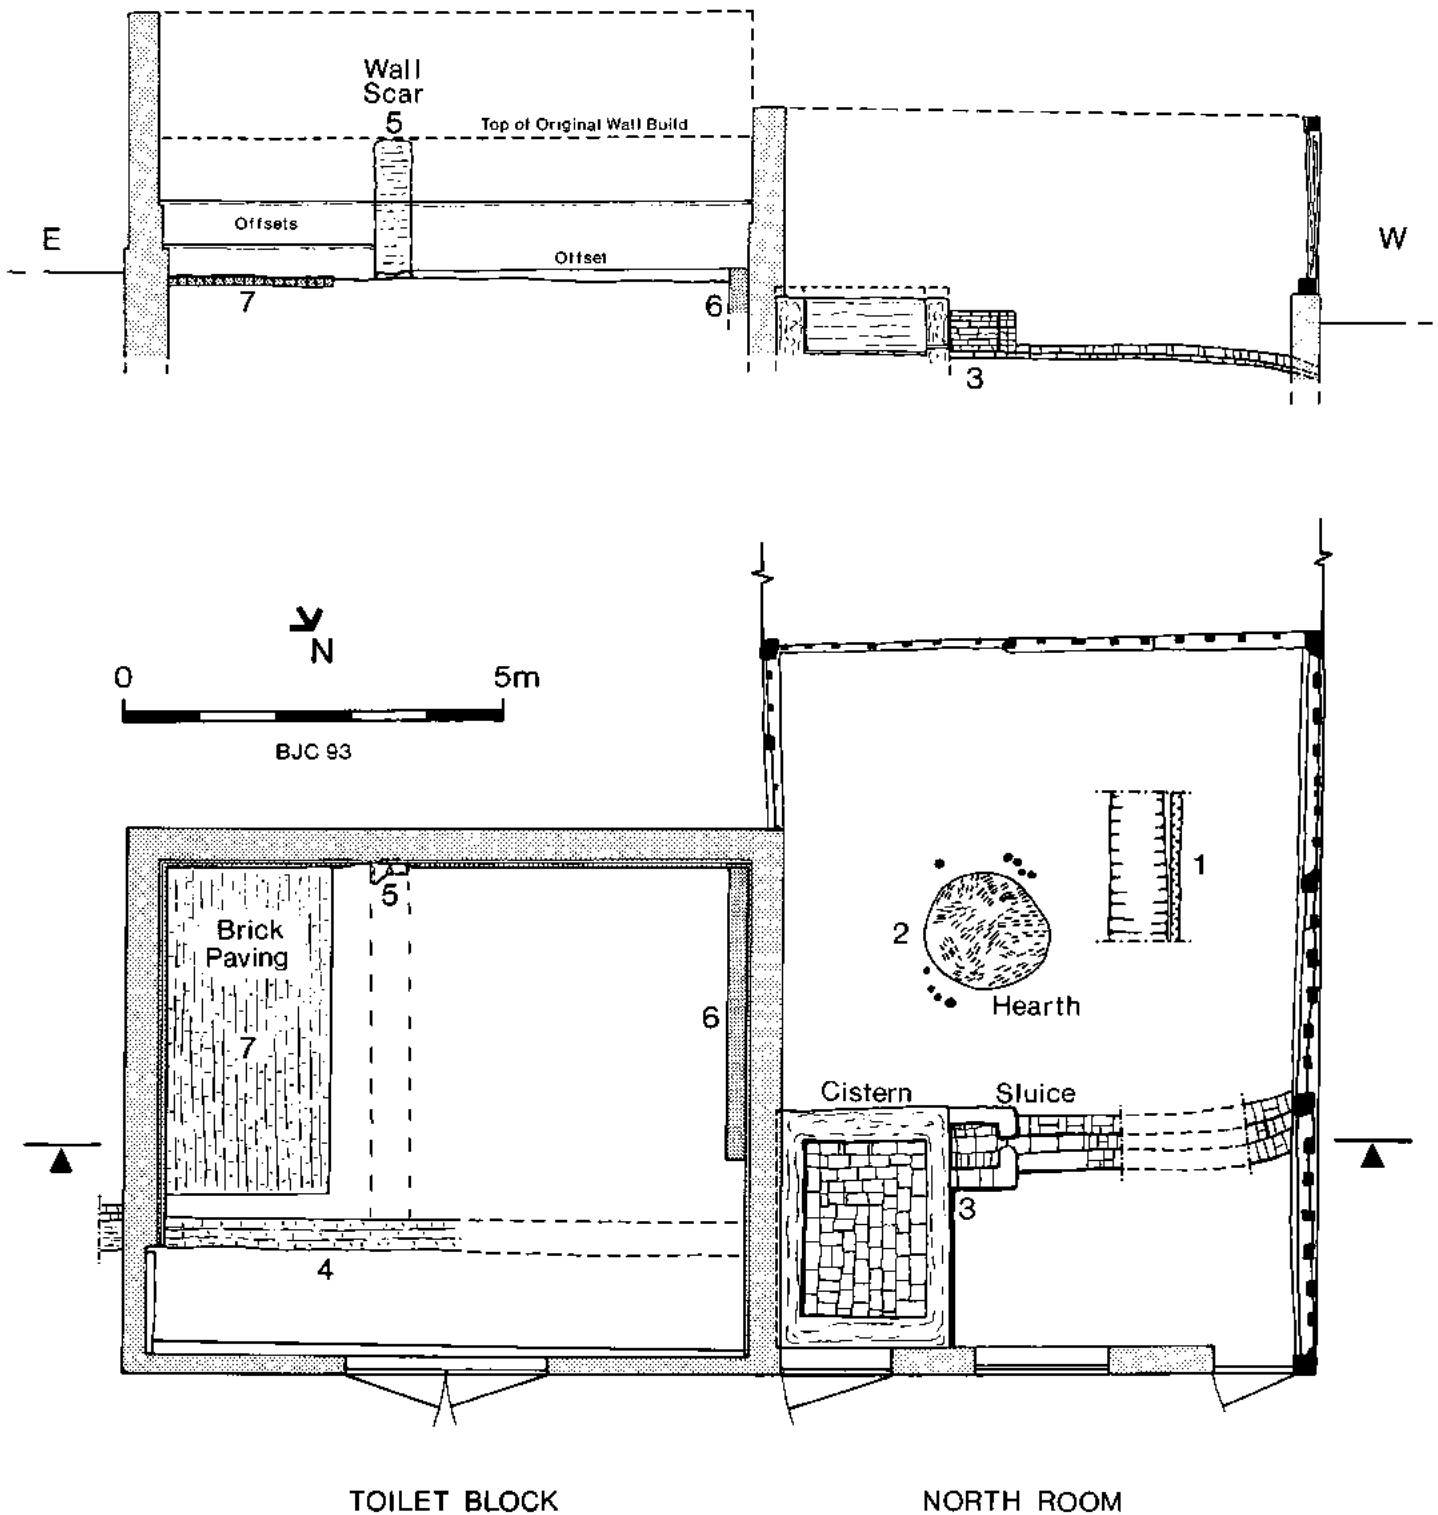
Plan of the excavations in the north room of the Granary and the adjacent building, with a section and elevation (above) facing south.
